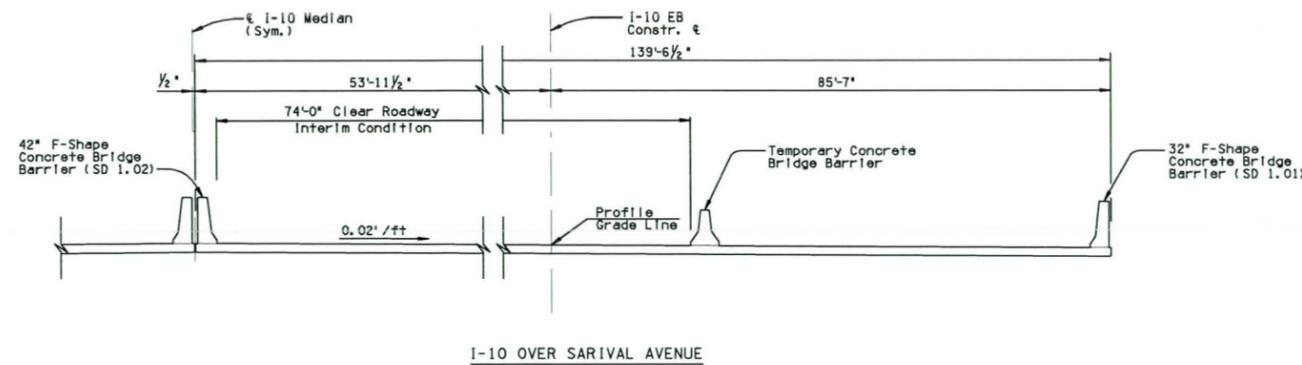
I-10 Over Sarival Avenue Typical Section
